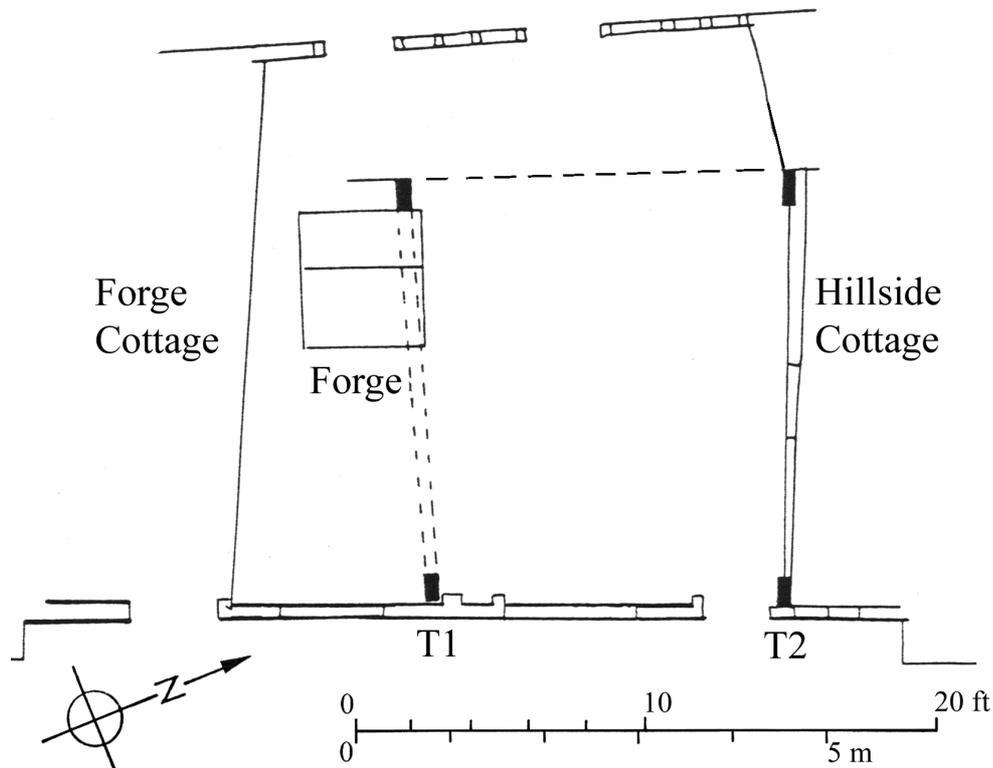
Plan, showing truss numbering (from Steane (1985)).
